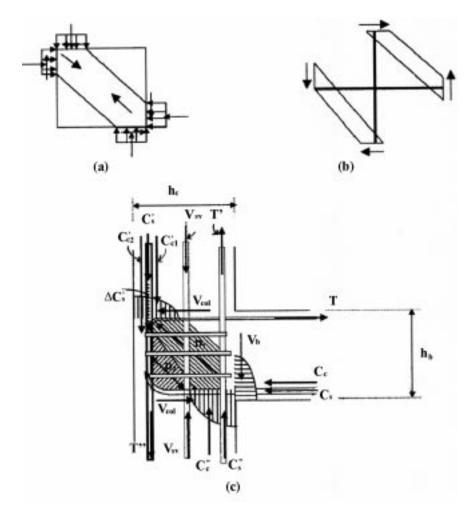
The diagonal strut mechanism; (a) and truss mechanism, (b) in interior beam-column joints, (c) idealised stress paths in exterior joints
